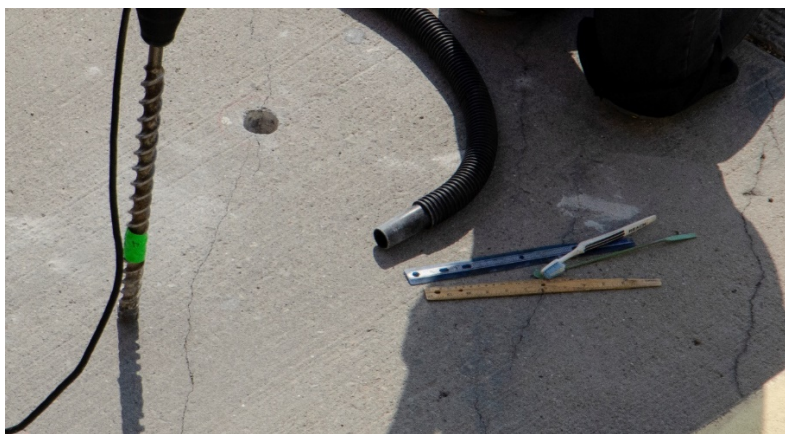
Photograph of region of concrete around sample hole R5 showing surrounding cracks as well as equipment used to make destructive measurements.
